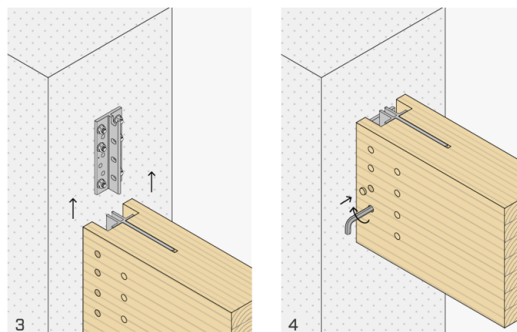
Connection between glulam beam and concrete column using a hidden steel connector [81]
